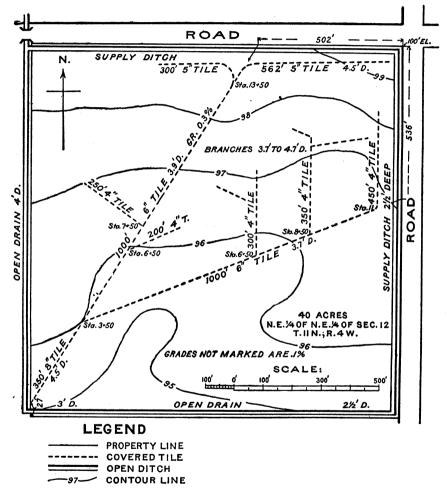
Plan of draining Getz field, Point Lookout, Utah.
